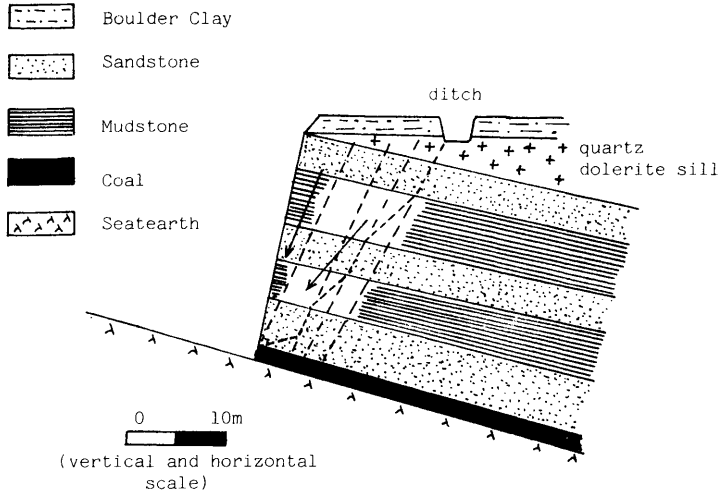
Highwall sliding and wedge failure at an opencast coal site (After Scoble 1981)
